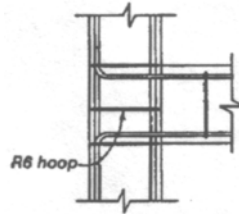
Detail of exterior joint specimen O7 demonstrates anchorage of beam rebar bent into the column. (Hakuto 2000)
